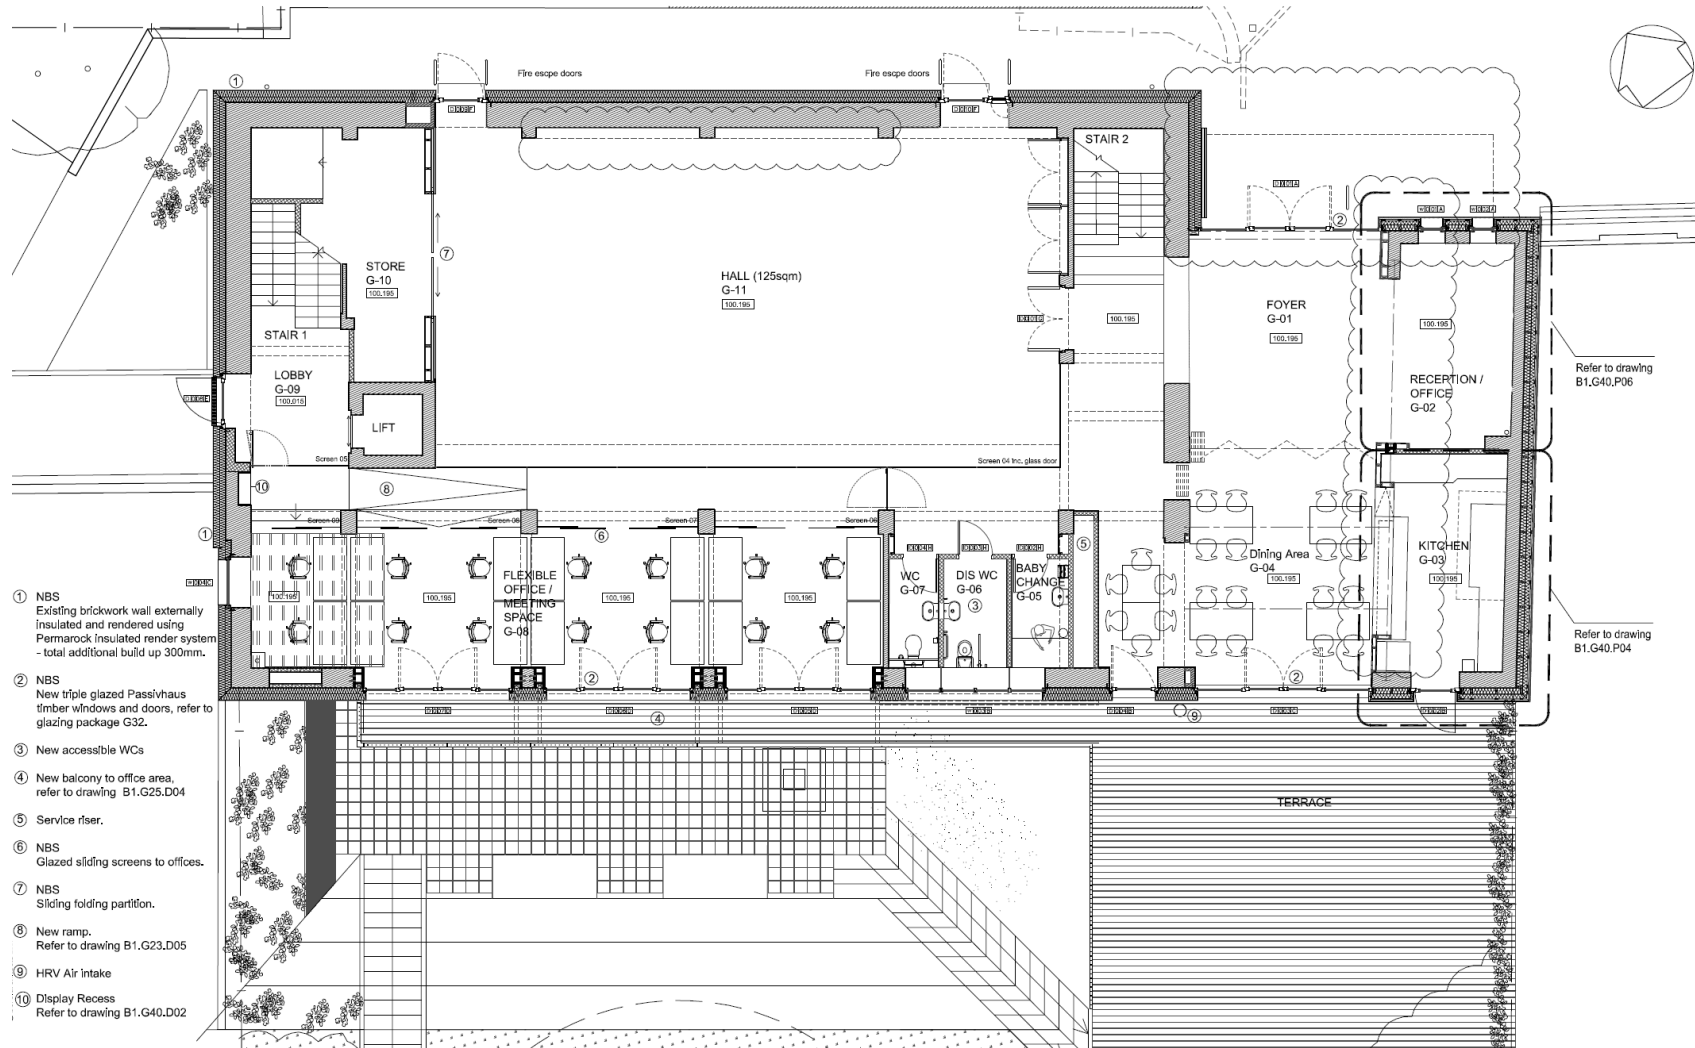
Architectural Plan Post-retrofit Mayville Community Centre Ground Floor
